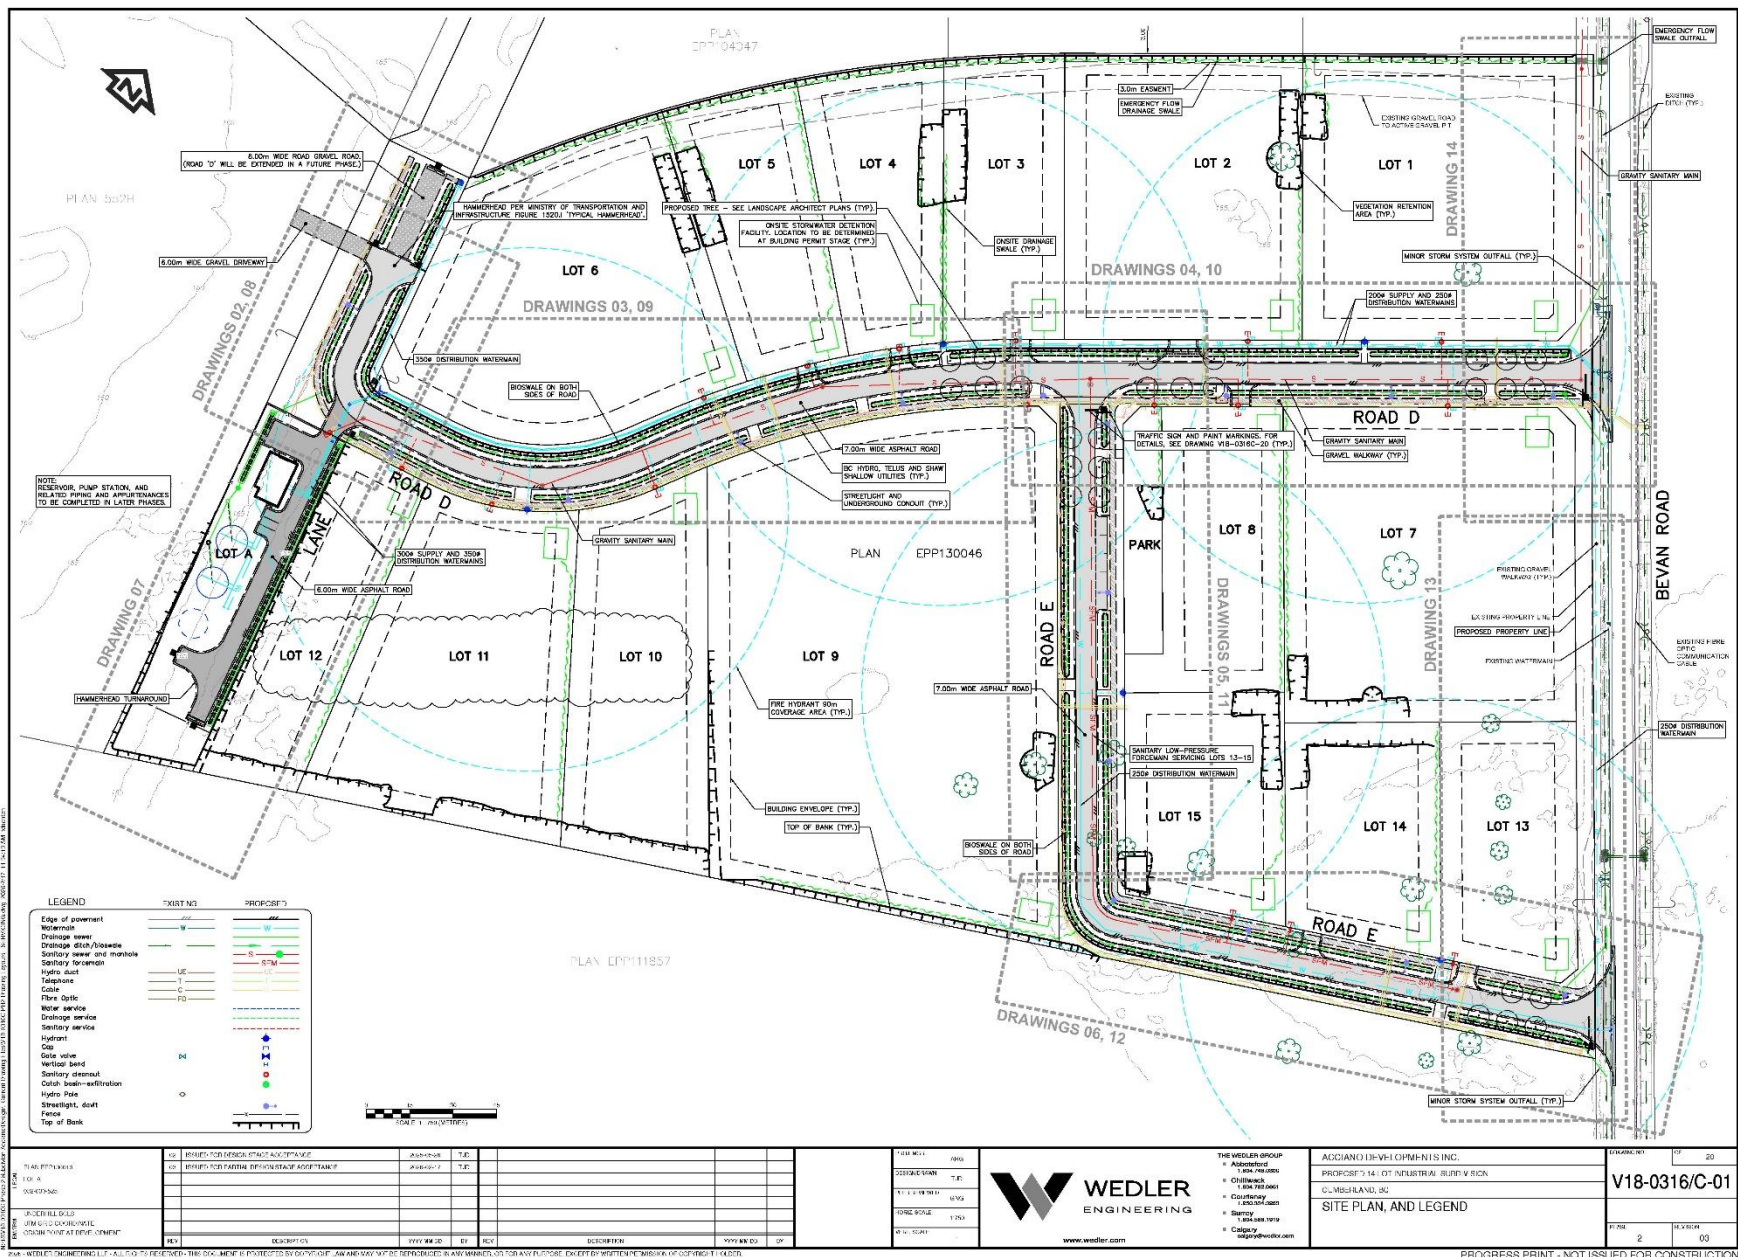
Site plan showing site servicing for Phase 2a. Adapted from Wedler (Phase 2 Industrial Subdivision Site Plan - Revision 3, 17 February 2026).
